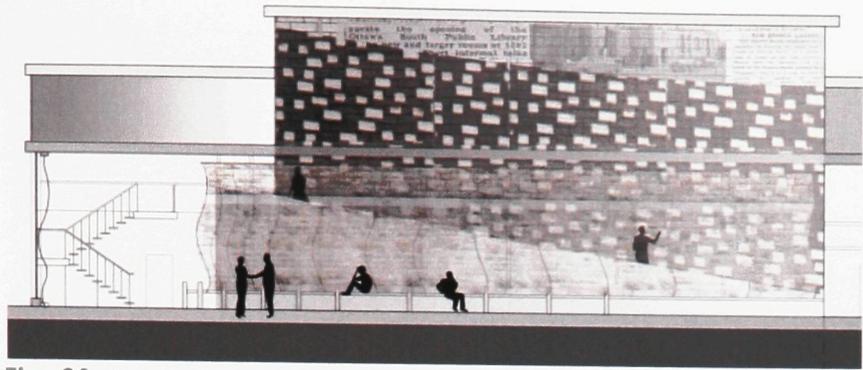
Section showing new public reading area on main floor with un-fixed stone printed fabric walls, Rebecca Han, 2011
